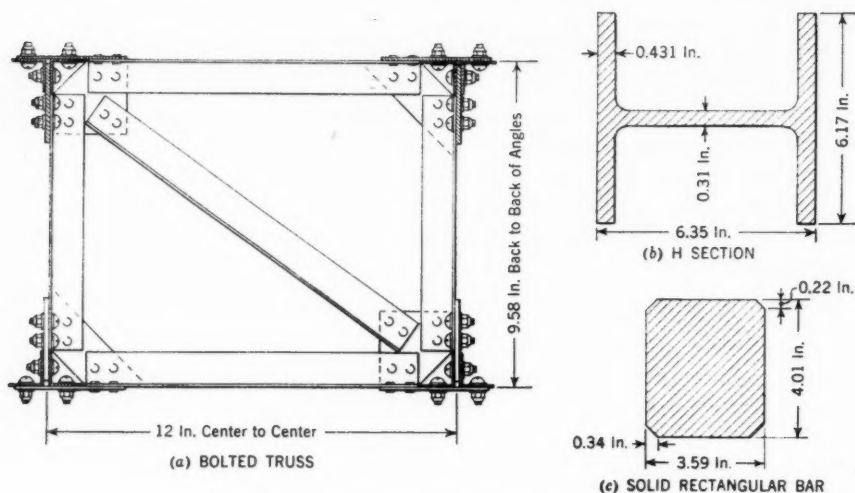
CROSS SECTION DIMENSIONS OF SPECIMENS
